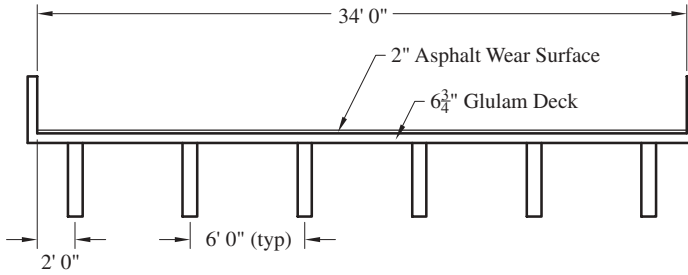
Typical girder bridge section—Example 18.2-1.
